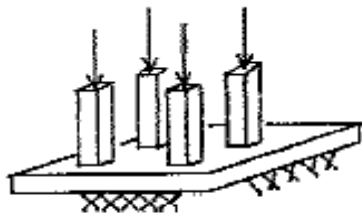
Typical mat foundation (FHWA, 2002c).
